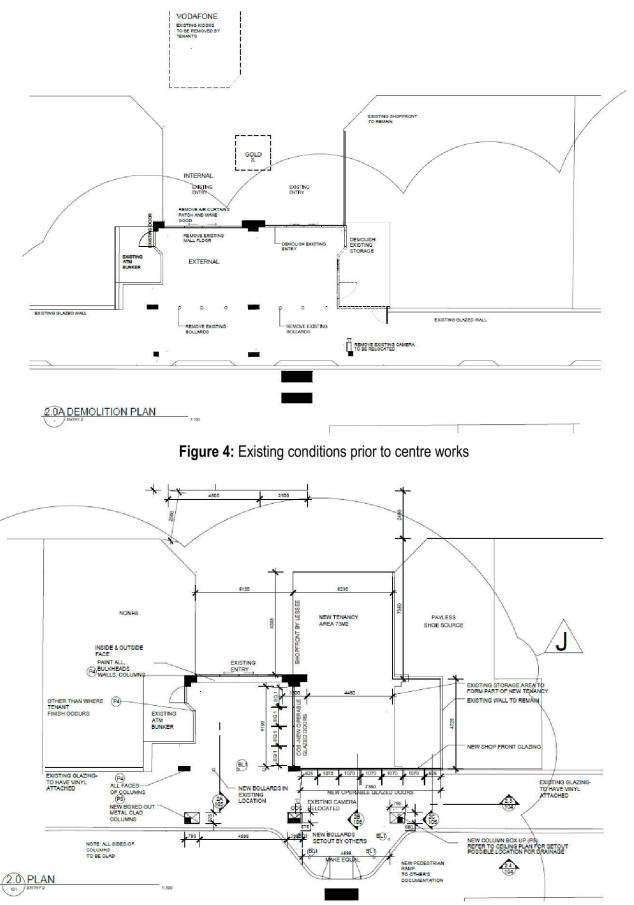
Centre works with new tenancy (glazed doors changed to solid wall)
